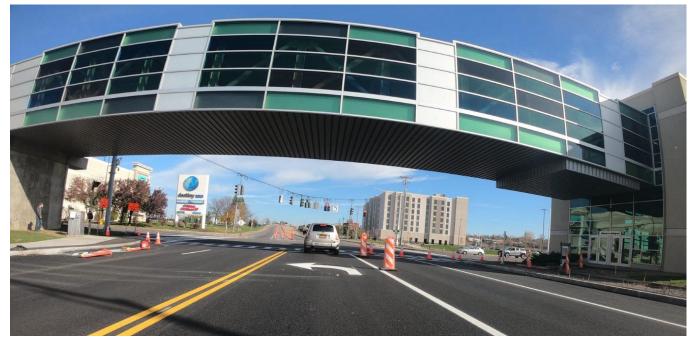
Hiawatha Boulevard West looking towards the Solar Street Intersection – repaving, restriping, and pedestrian facilities under construction. Embassy Suites is the hotel shown in the distance on the right side of the image. An enclosed pedestrian bridge connects the Solar Street lots to Destiny USA. The bridge spans above Hiawatha Boulevard and Harborside Drive. The bridge casts a shadow on the road and crosswalk beneath. Lighting does not exist on the bottom of the bridge. The bridge's Hiawatha Boulevard entrance (shown) did not appear to be ADA accessible (with door push buttons). Pedestrian facilities at the intersection were under construction at the time of the site visit. Sidewalks do not exist between the mall's entrance (approximately 130 feet away) and this intersection. Furthermore, the mall's entrance is not at grade level and must be accessed by traveling approximately 170 feet along Harborside Drive (no sidewalks) to a crosswalk that provides access to a ramp on the opposite side Harborside Drive. The ramp extends approximately 190 feet to the mall's entrance.
